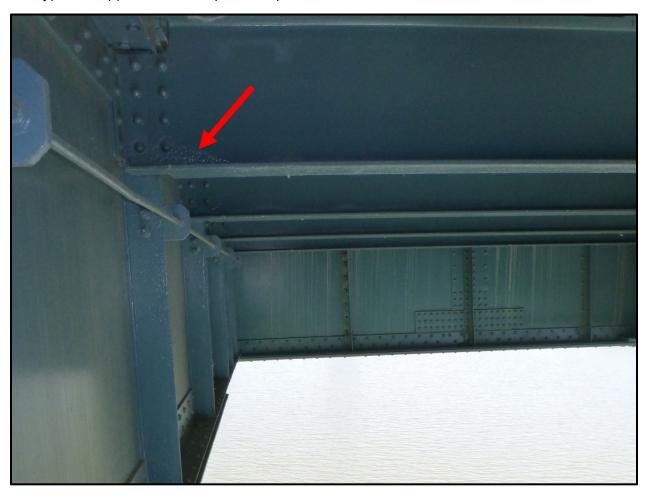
Typical Painted Over Section Loss at Floor Beam Connection
